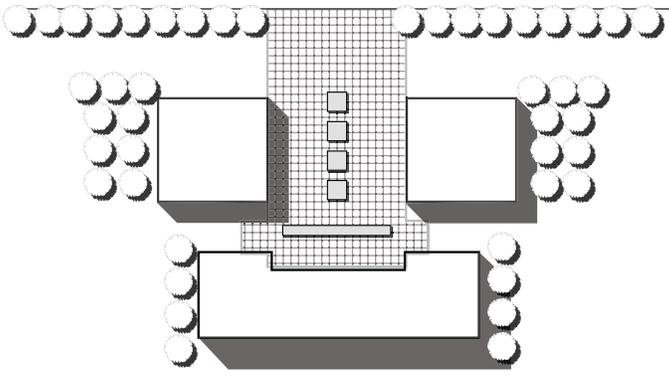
Buildings should frame and enclose outdoor gathering places
